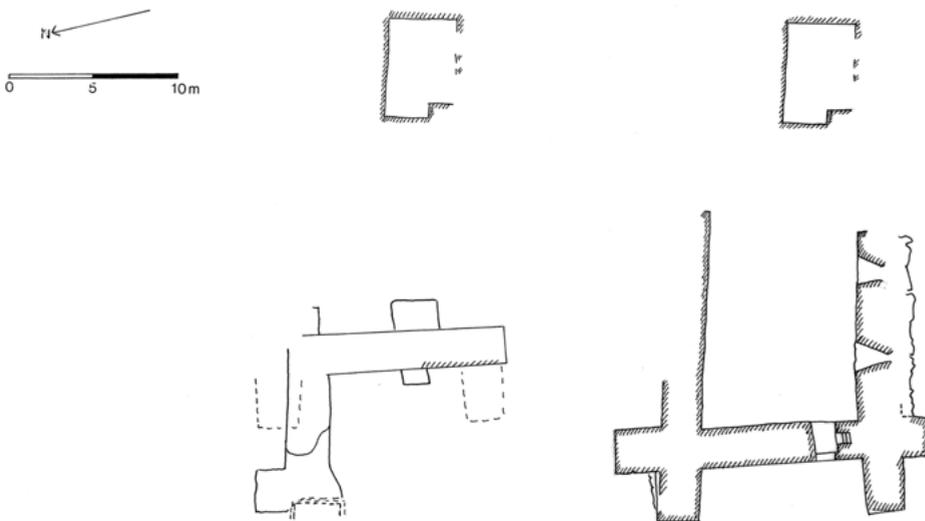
Oslo. King Hákon IV's failed building project at the later site of St Óláfr's. To the left the first building phase, possibly terminated by a fire in 1224. To the right the second and revised building phase, abandoned in the 1220s or before the mid-1230s at the latest. After Hommedal (1986:ill. 15).
